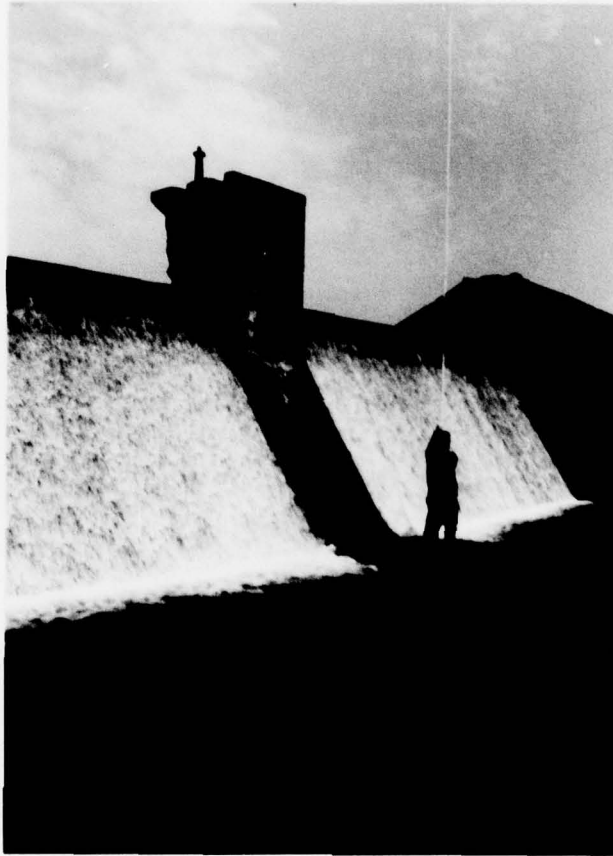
View of spillway from downstream, showing low-level outlet.
